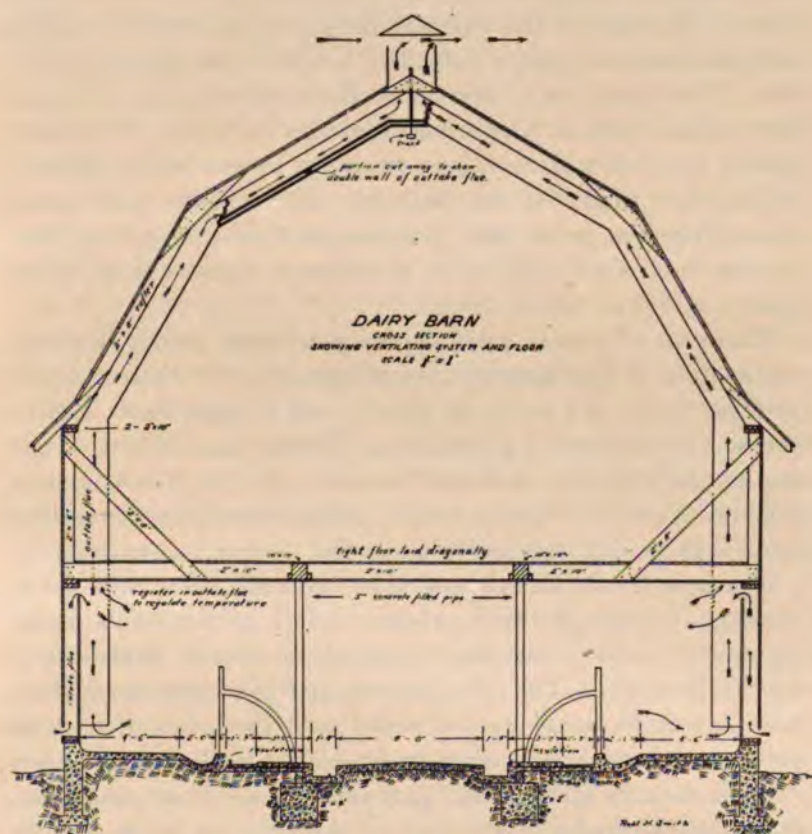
PLAN OF DAIRY BARN, SHOWING VENTILATION SYSTEM AND FLOOR.
